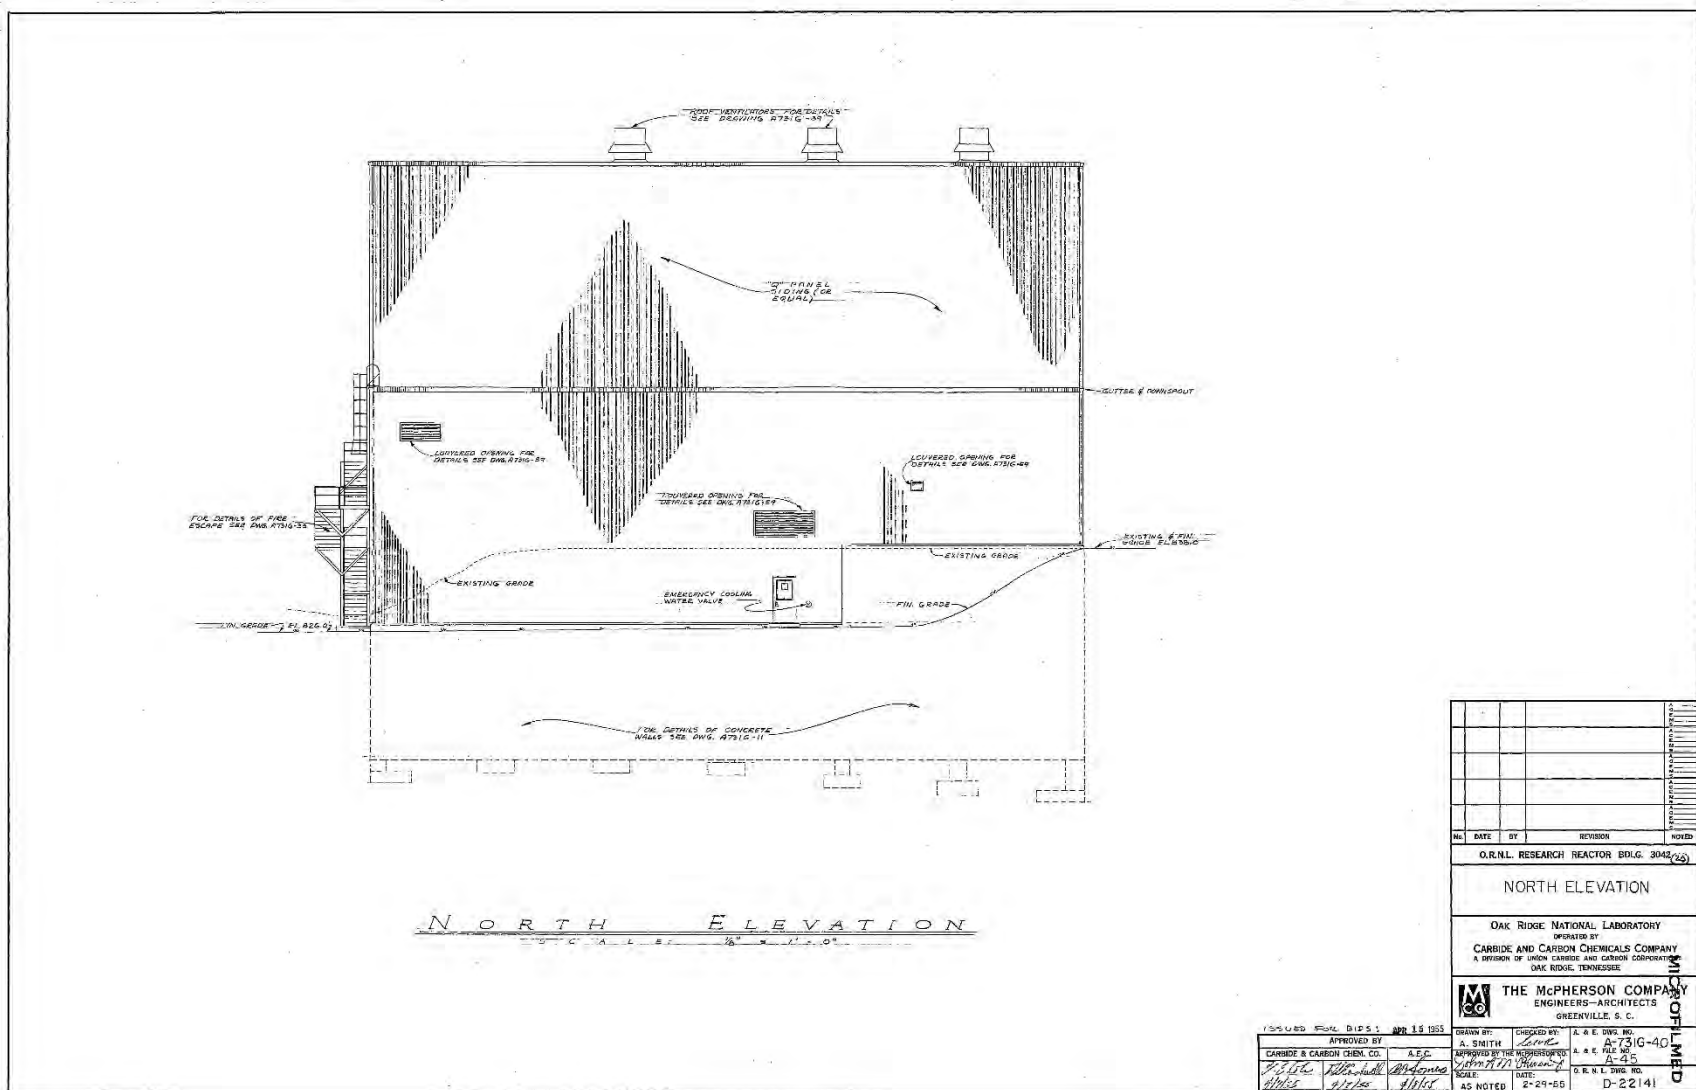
North elevation of Building 3042 (The McPherson Company, February 28, 1955).
